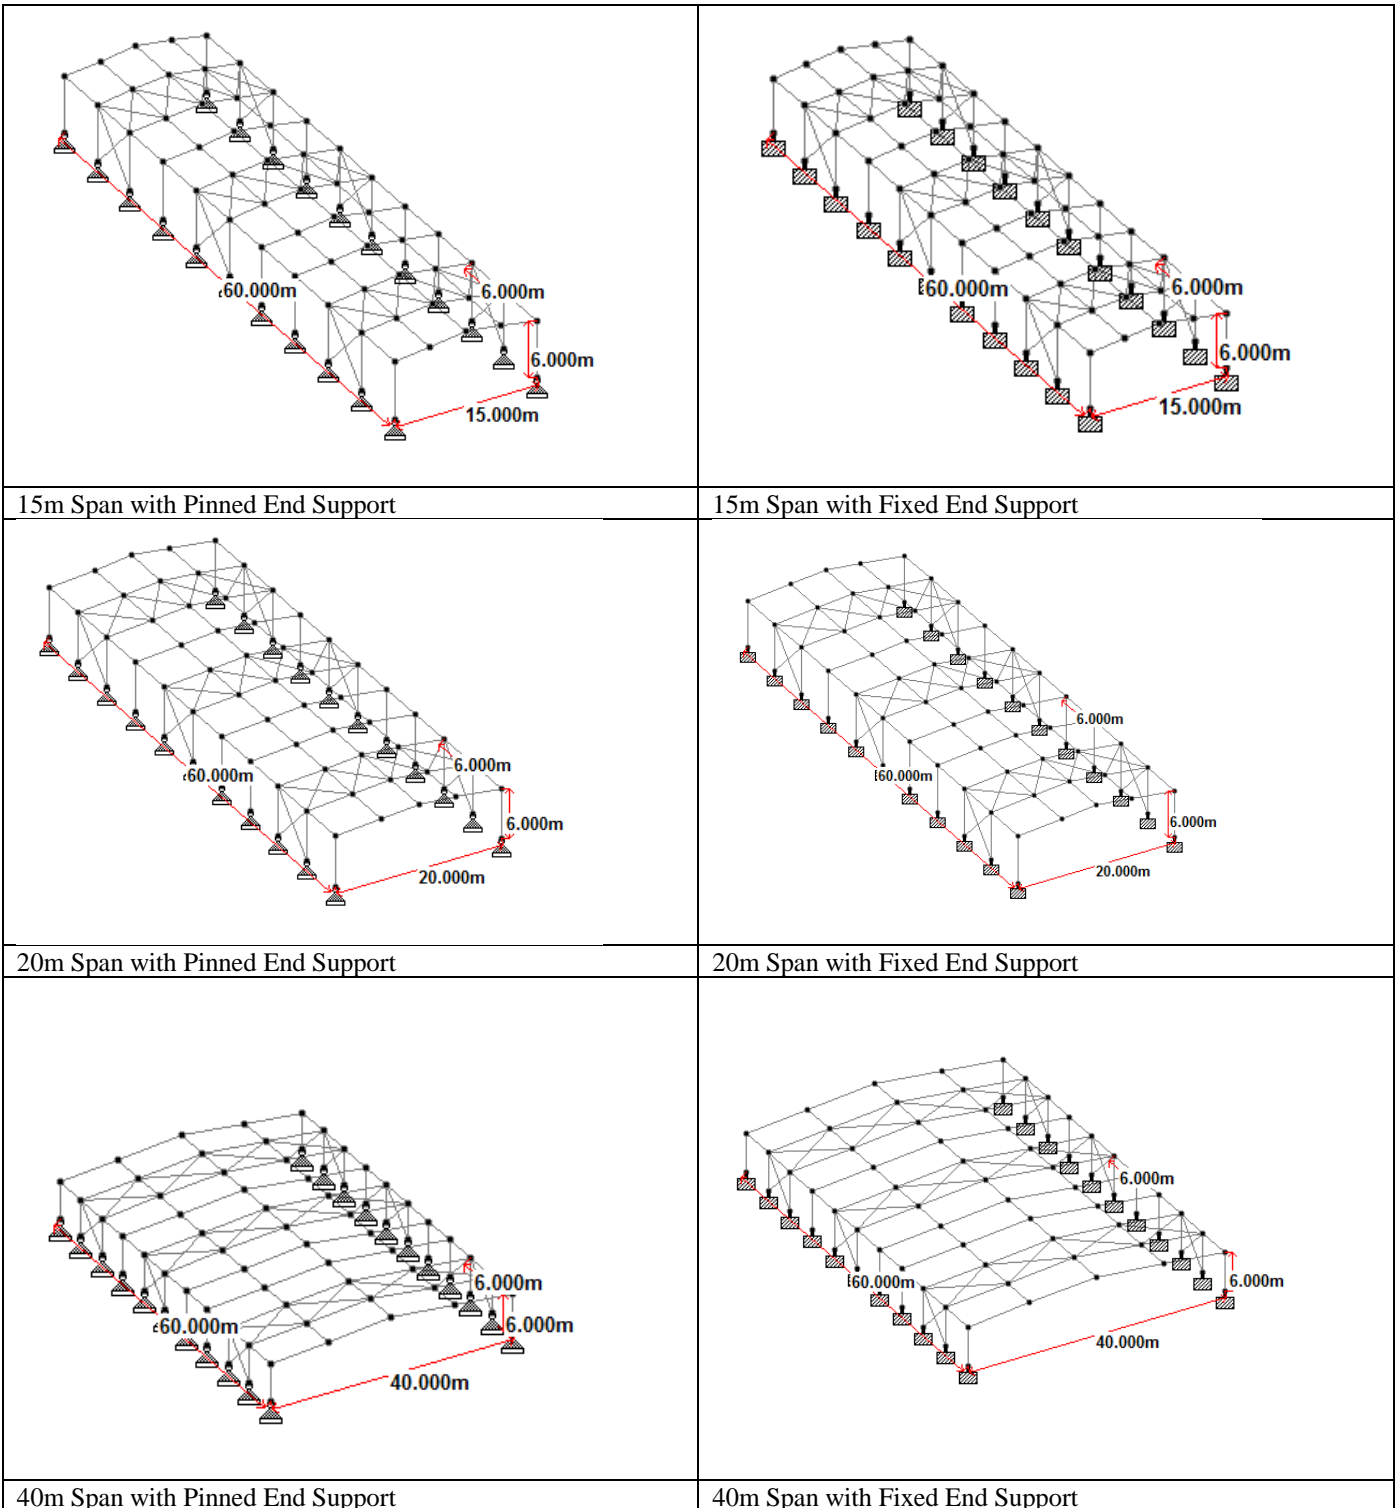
STAAD models of warehouse of span 15m, 20m and 40m
